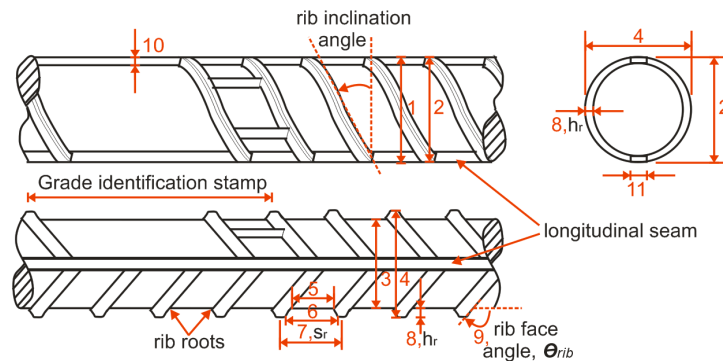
Two elevations and a cross section labelling the features and measured geometry of the deformed reinforcing bars used for the bond tests.
